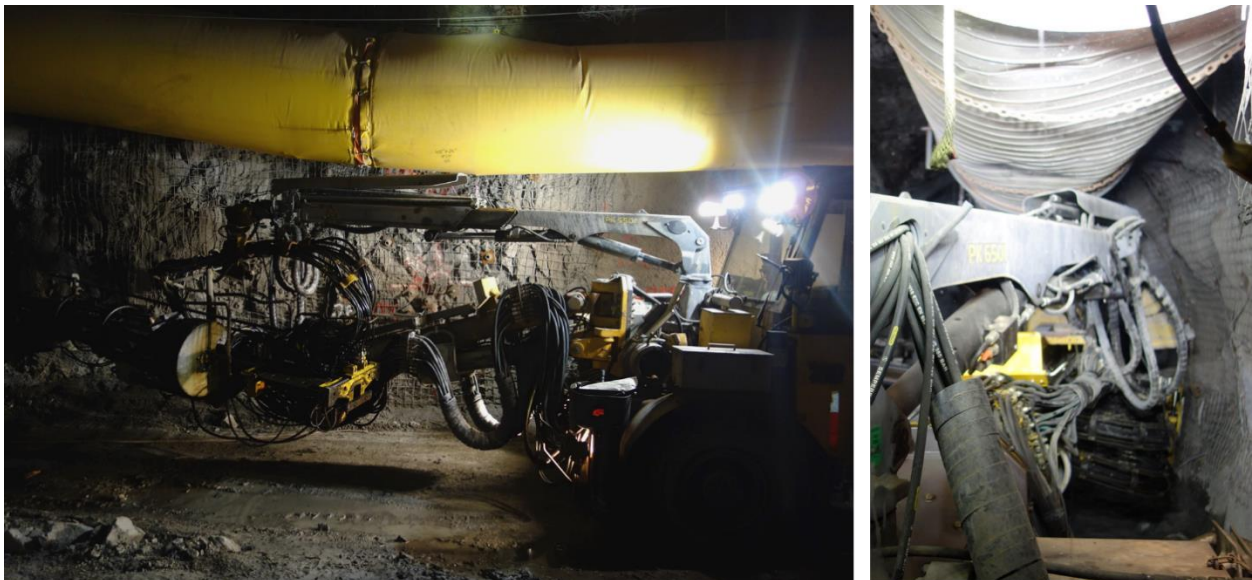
Left: Ventilation tube clearance during tramming; Right: Steel ducts damaged by tramming equipment with insufficient clearance
